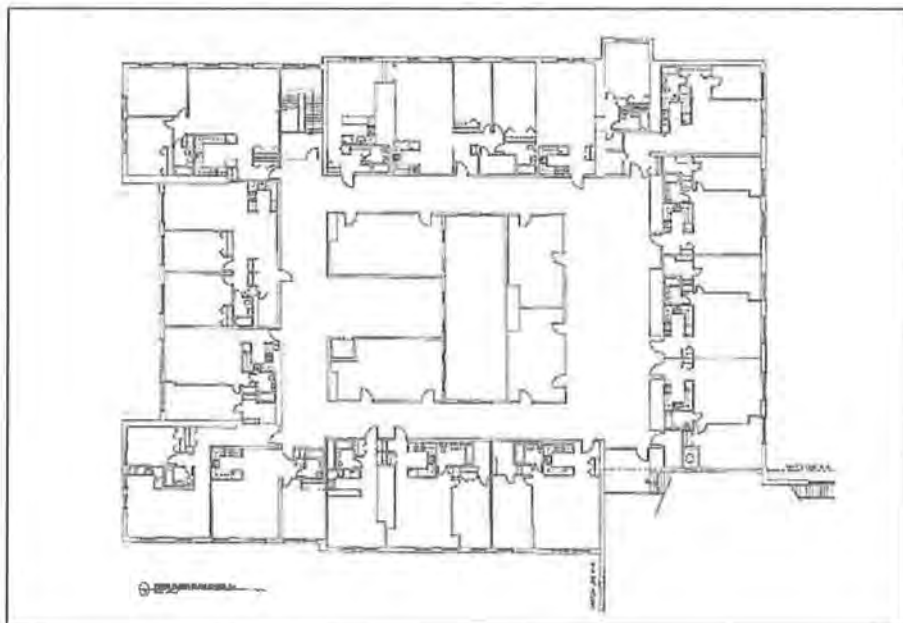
C: Existing Floor Plans – Building 1 – Third Floor (1929 Structure)
